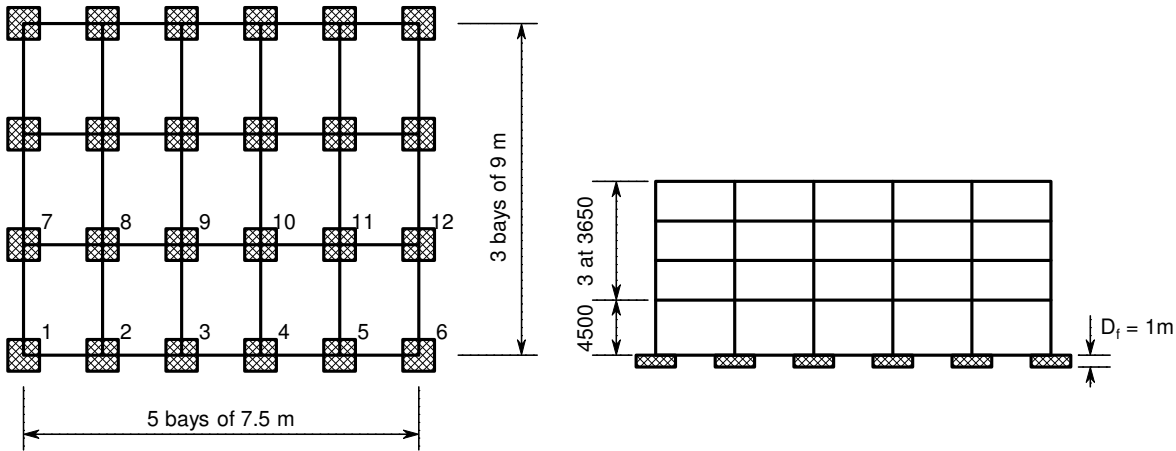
Three-storey structure: elevation, plan and footing numbering.
